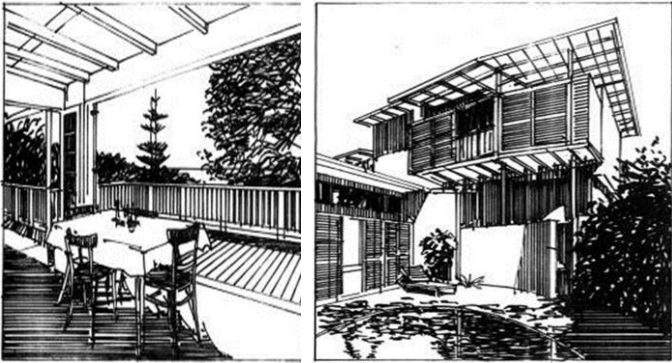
Outdoor living oriented to take advantage of views(4.6) Figure 9: Lightweight construction with sub-tropical theme (4.6)
